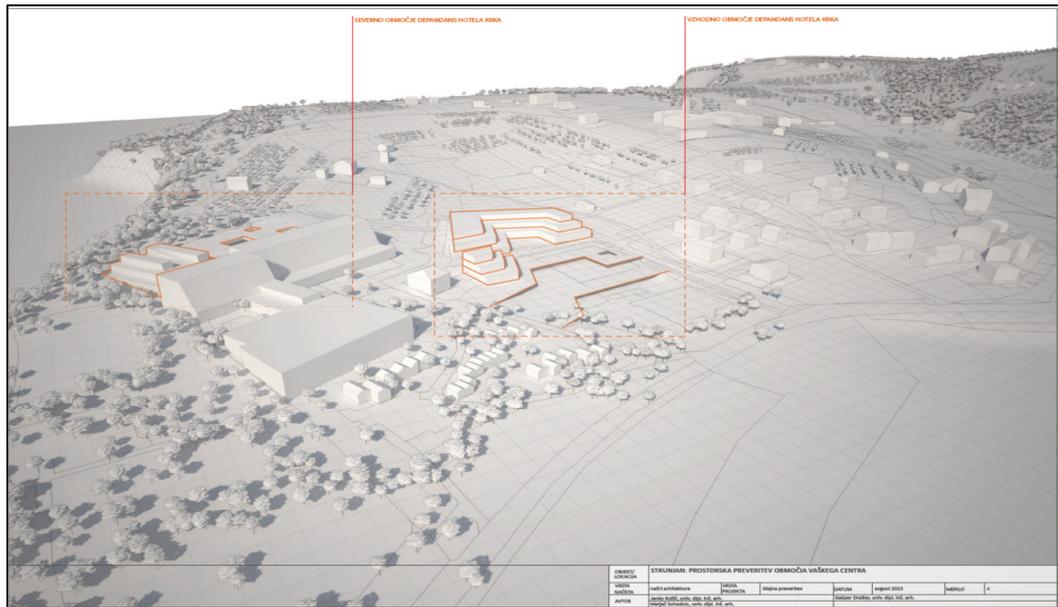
Area 7 - Spatial arrangement area of the Terme Krka Hotel.
